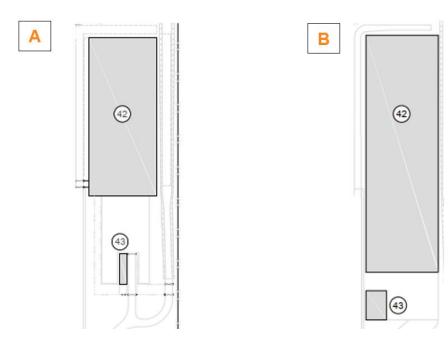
Interim Spent Fuel Store (42) design comparison. A: Original including Access Control Building (43); B: Proposed including new Equipment Storage Building (43)
